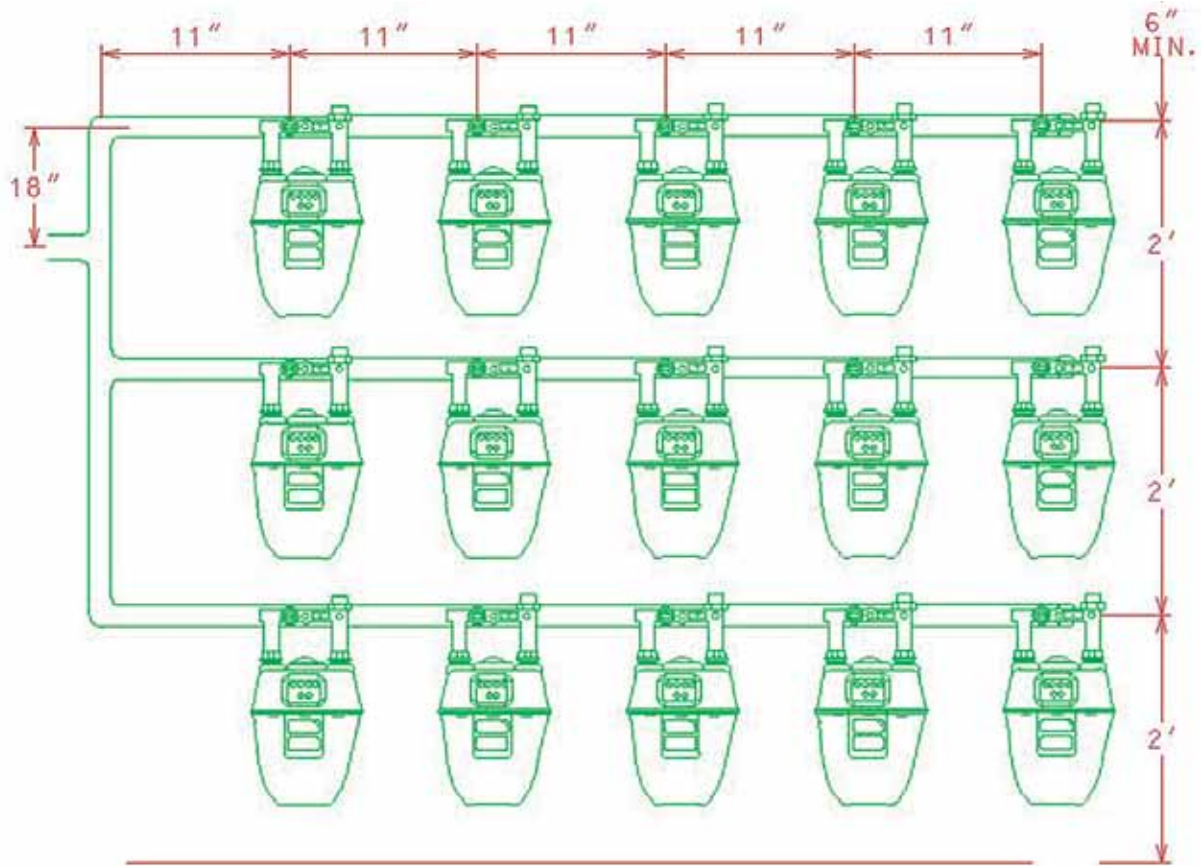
This is a typical inside meter rack where the floor-to-ceiling height is less than 8 feet. MGE would install the rack on an outside wall with meter rows going three high and extending out to accommodate the number of meters desired. This rack will either extend from the wall penetration and go left to right or right to left depending on available space. The dimensions are relatively accurate, but verification of room needs to be done by MGE's Gas Engineering Department. MGE would prefer the gas regulating equipment to be outside, but if circumstances dictate it being inside, we will consider installing it with the meter set. The wall to the front face of the meter will be approximately 18 inches. MGE requires the contractor to install meter protection posts and brackets to protect the rack/meters from damage. All designs of this and clearances will be verified by the Gas Engineering Department. MGE also requires the contractor to core holes in the wall of the building so associated gas pipes can be installed in the basement and vent lines can exit. Exact size and placement will be agreed on at the time of installation. This drawing is to be used as a general reference by engineers, architects, and designers. Loads and meters vary, so actual gas meter racks will likewise vary. Actual design can be verified with the Gas Engineering Department along with questions as to design and placement.
